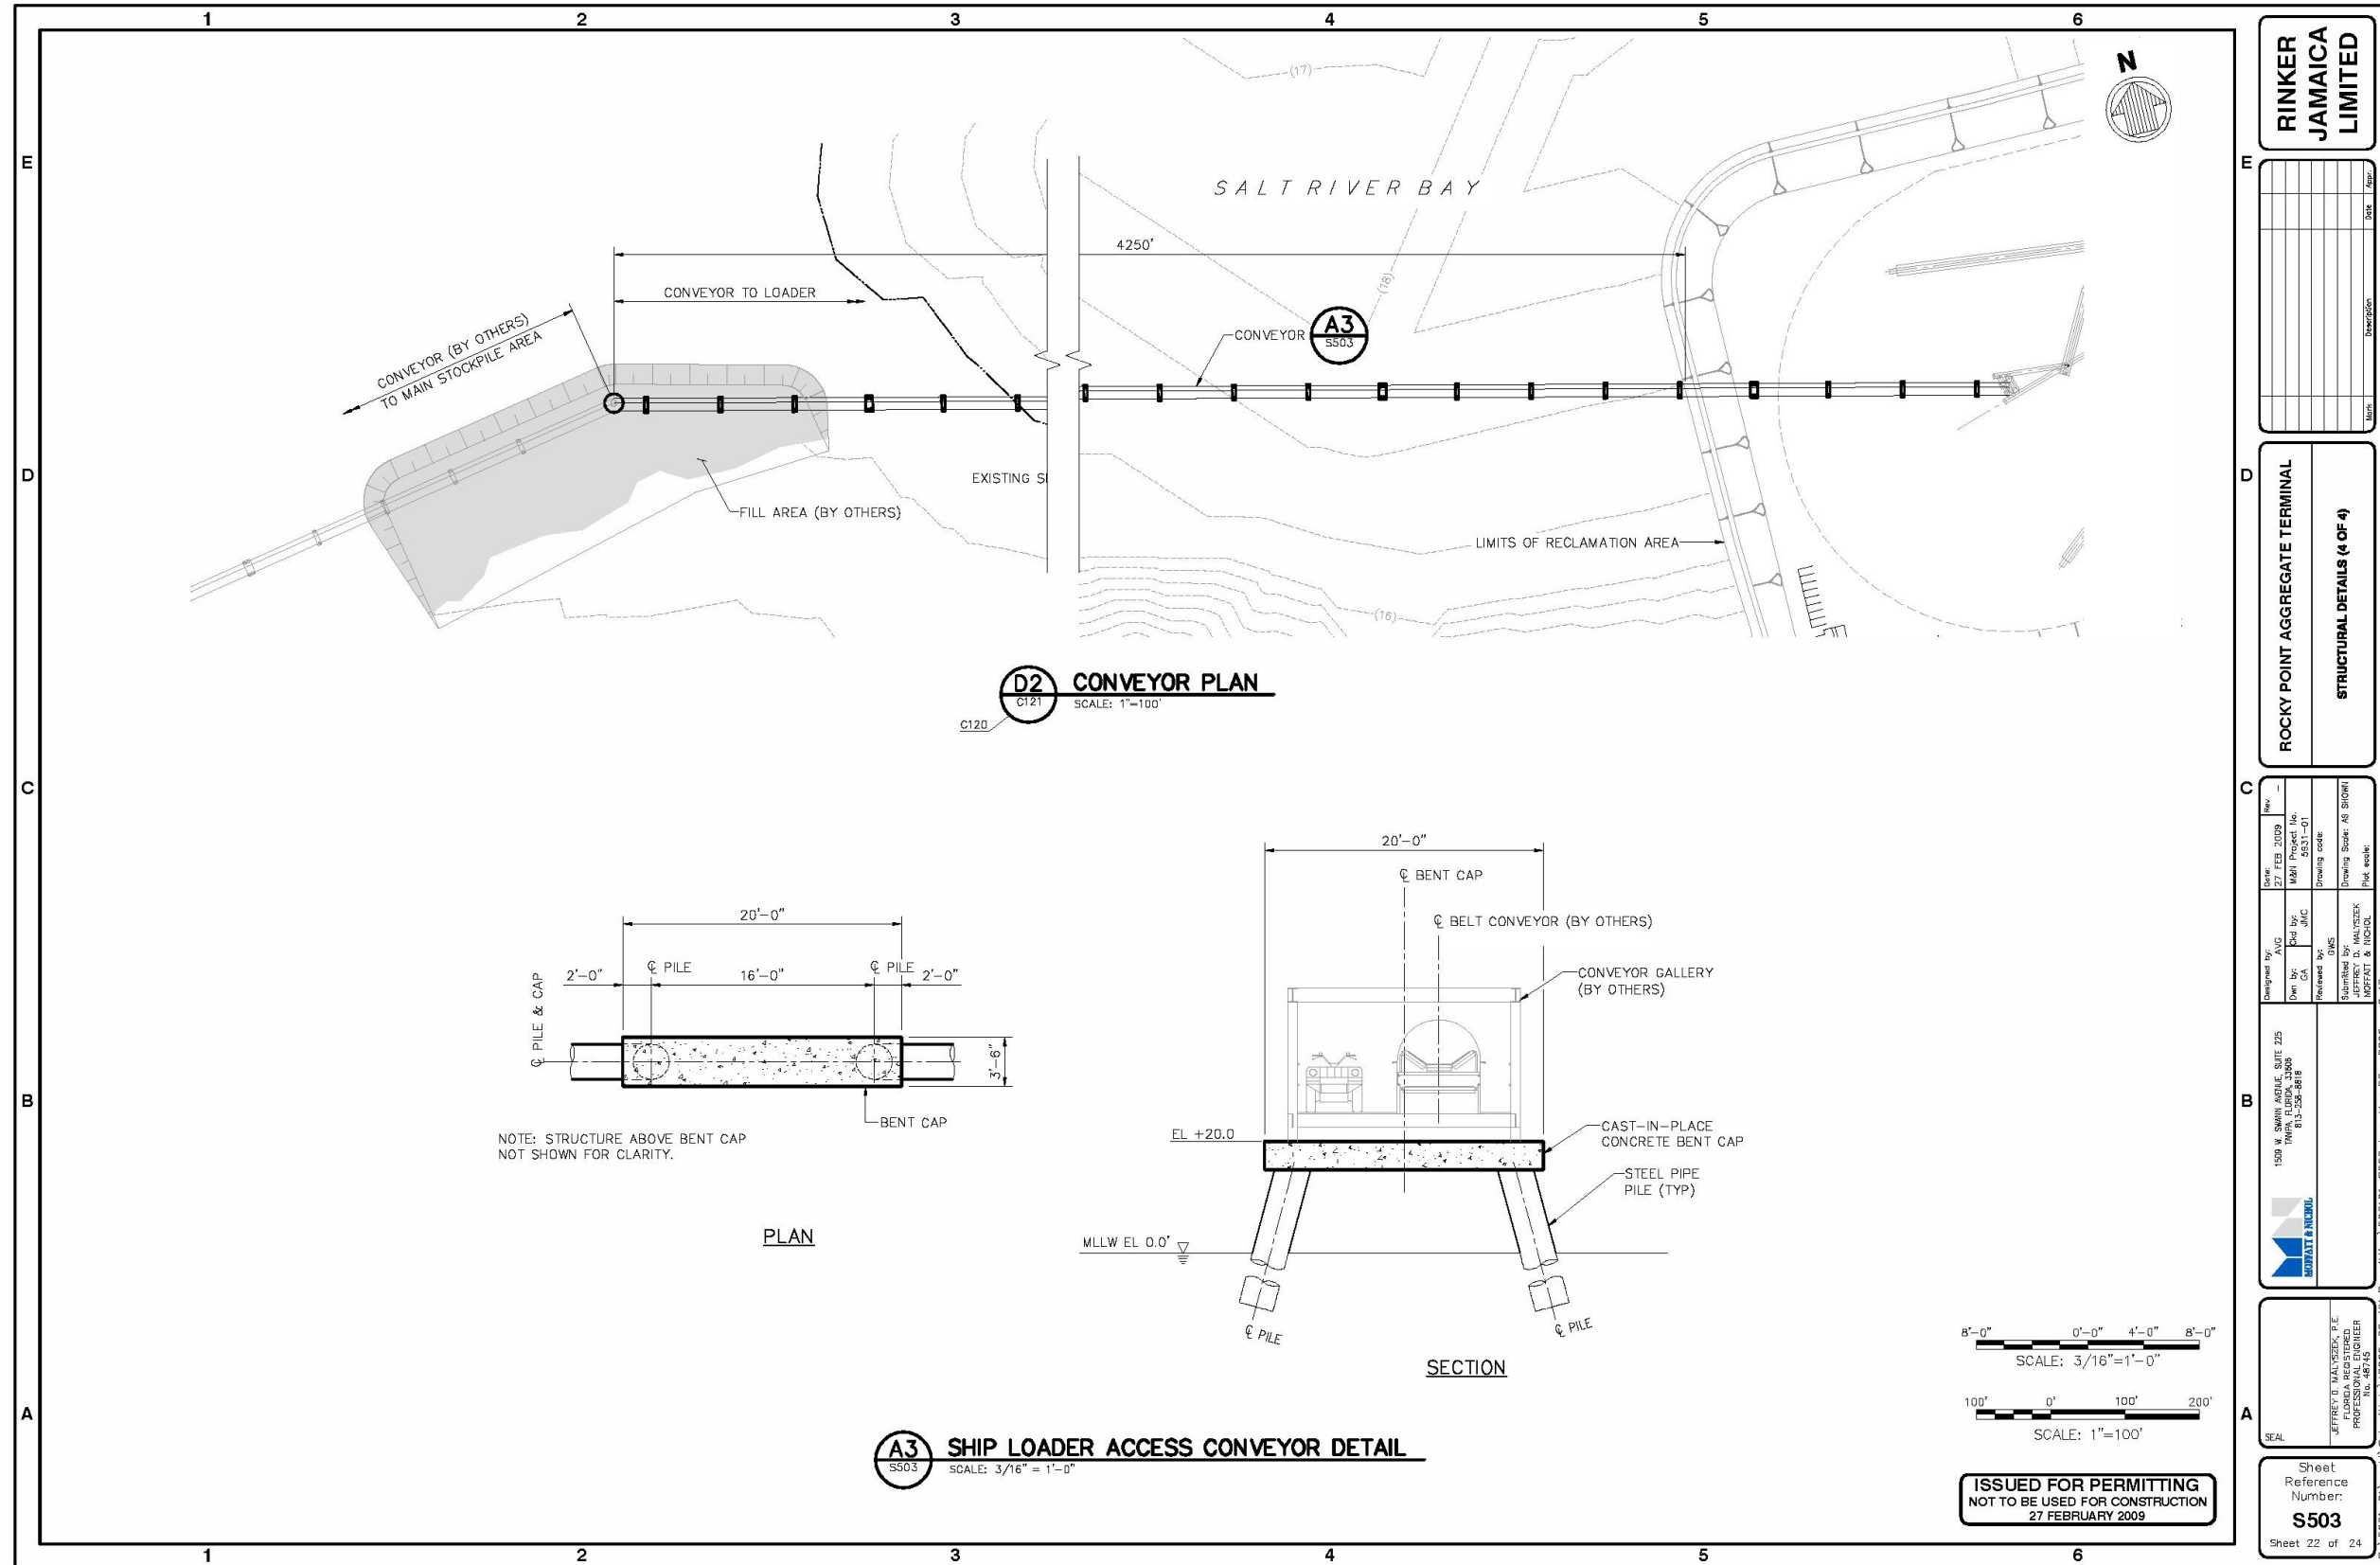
Structural Details [Conveyor Plan & Ship Loader Access Conveyor Detail]
